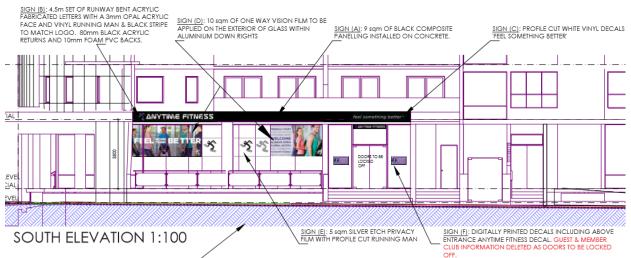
Southern elevation of Shop 1 fronting Innesdale Road. Proposed shop front and awning signage.
